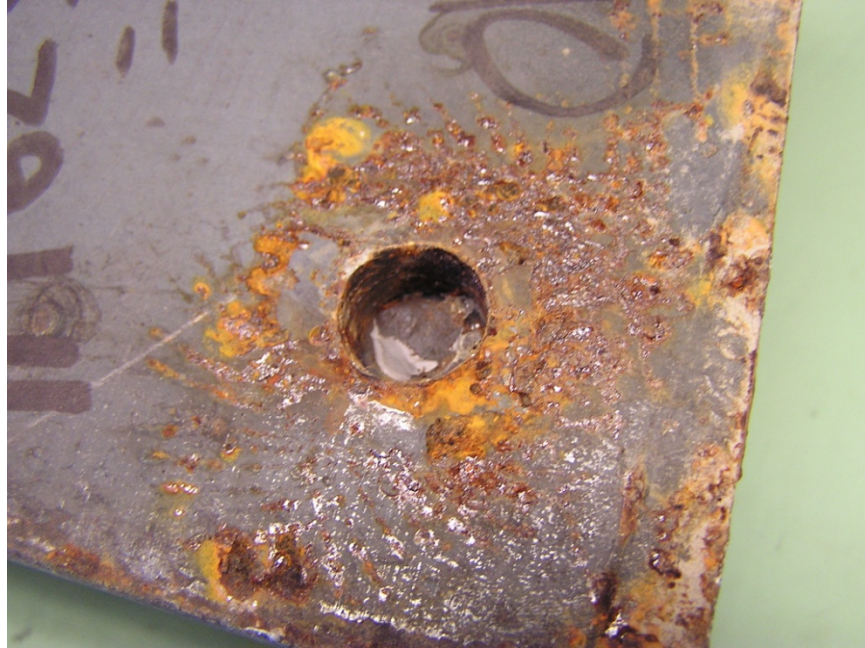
View of Bottom of Base Plate Showing Steel Anchor Element Failure Plane of Test Group A
